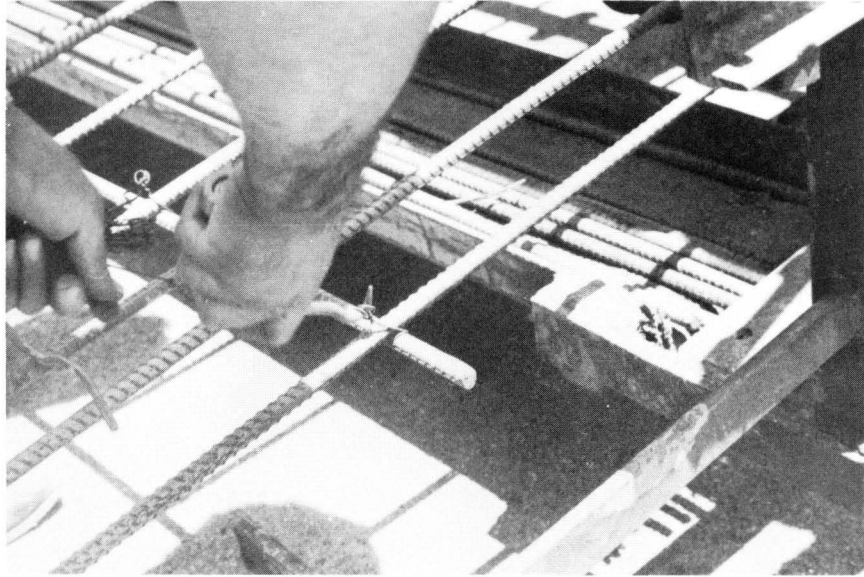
PROTRUDING END OF TRANSVERSE STEEL AT PAVEMENT EDGE.
